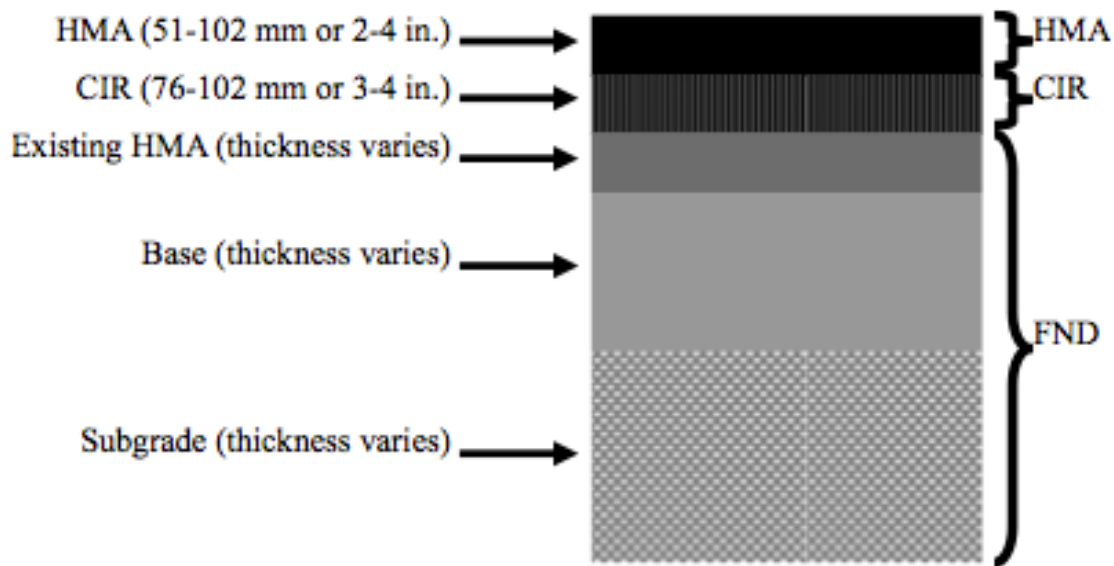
3-Layer Model CIR Pavement (Chen and Jahren 2007)
